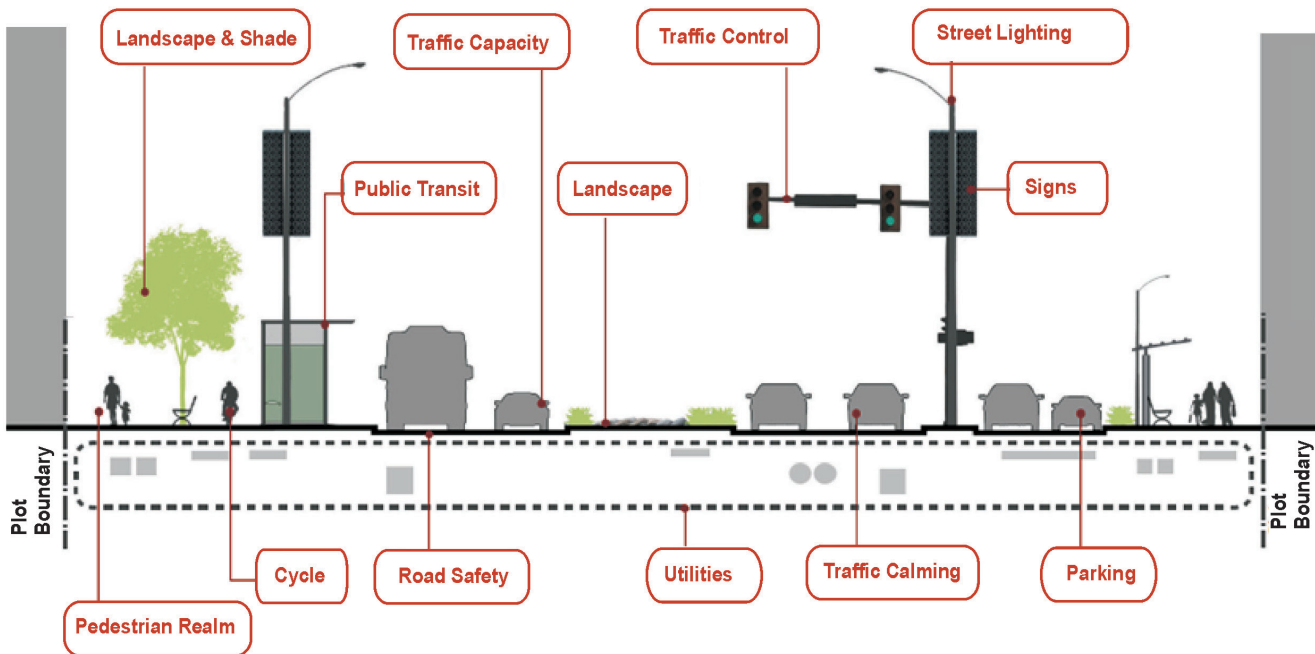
(b): Typical plan view and cross sections of Urban Arterial, Sub arterial, Collector and Access streets
